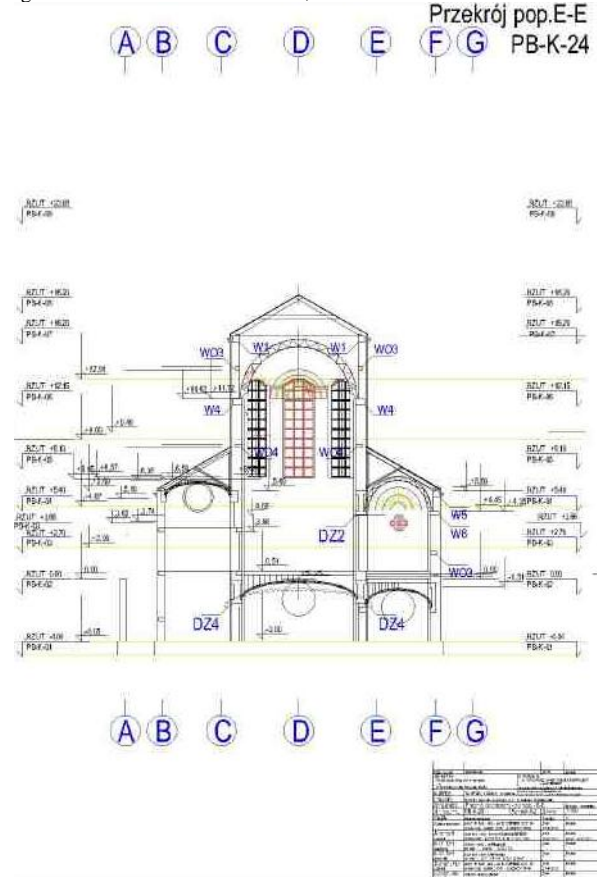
Vertical cross-section E-E, A2. Visible location of RC wreaths.
